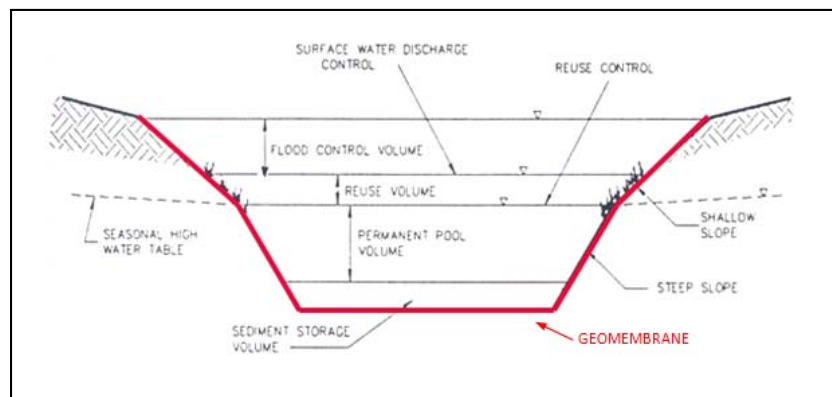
Typical retention pond structure (Stormwater Reuse, 2013)
